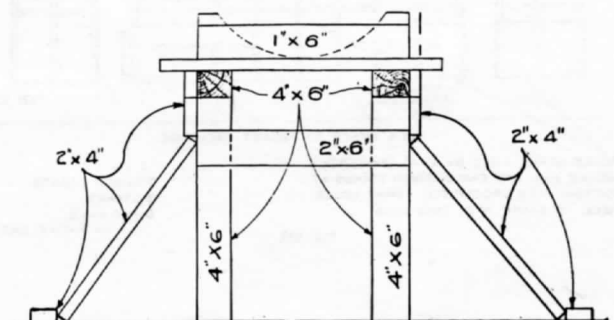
B. THIS METHOD OF SUPPORTING CROSSBEARER MAY BE USED IN BOX CARS INSTEAD OF CRIBBING 'A'.
